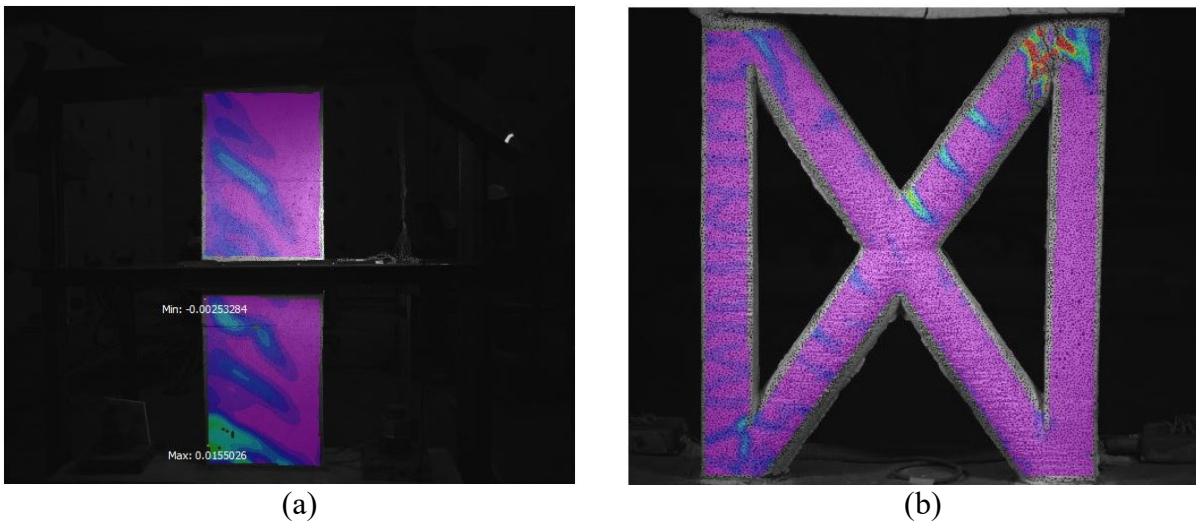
Damage at 1.5% drift in the (a) control wall and (b) optimized wall (lateral load is being applied towards the right in both figures)
